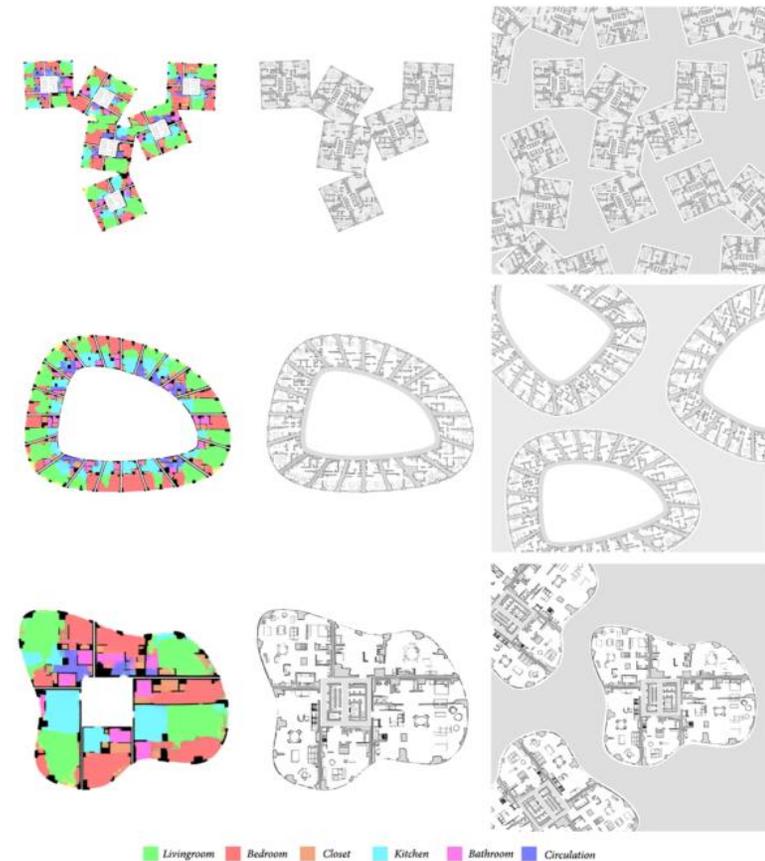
Building layouts by ArchiGAN: a Generative Stack for Apartment Building Design (Source: Chaillou, 2019)
